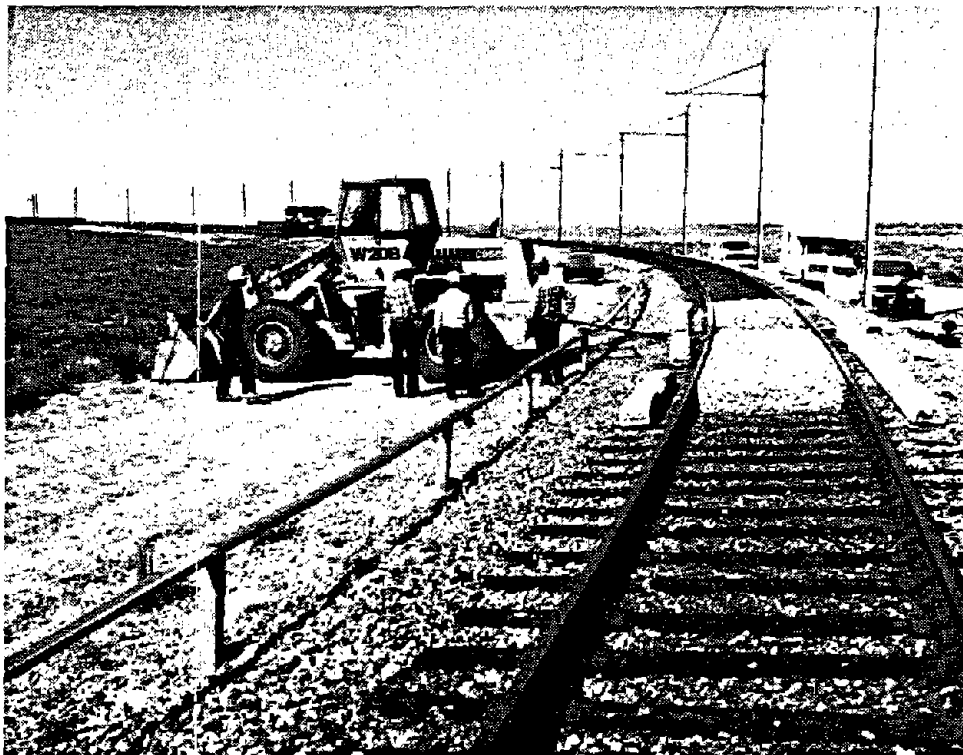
FRONT END LOADER ANCHORED TO THE RAILS AT LOCATION 6
